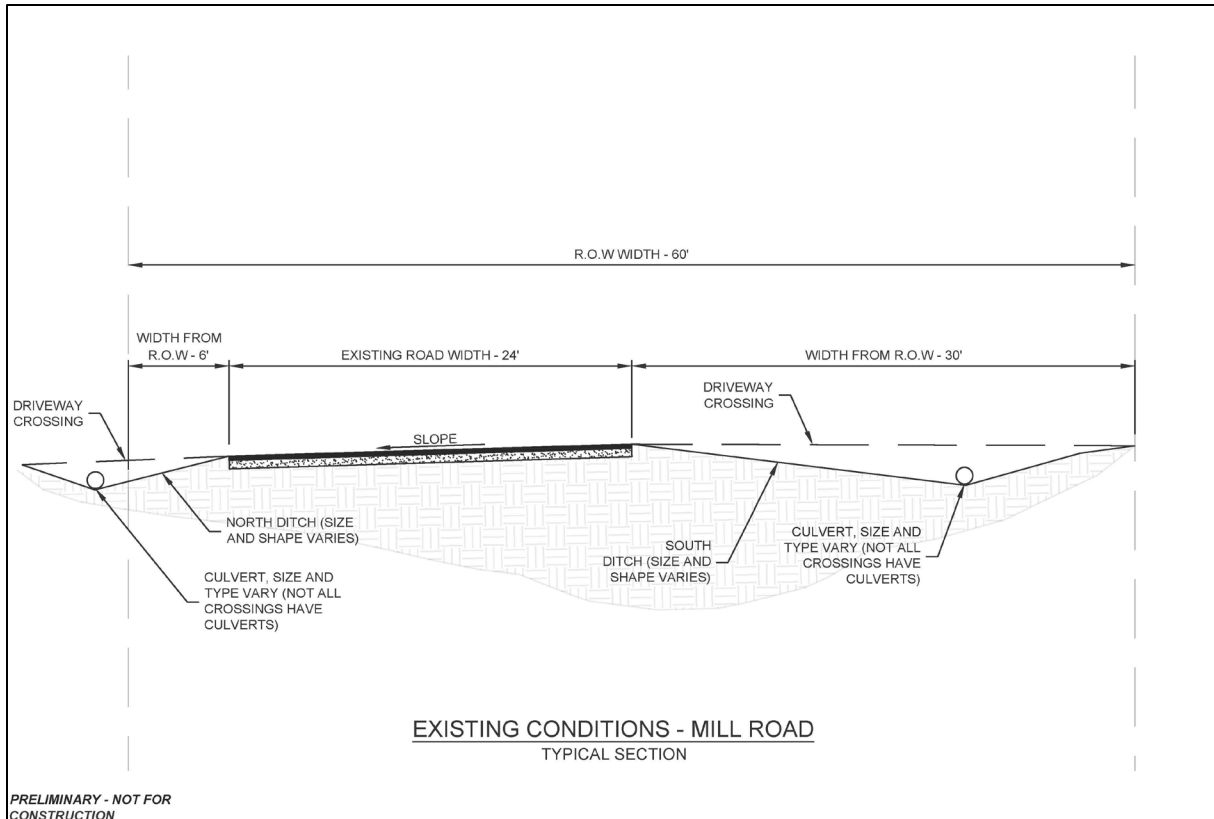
Typical section depicting the existing conditions of Mill Road.
